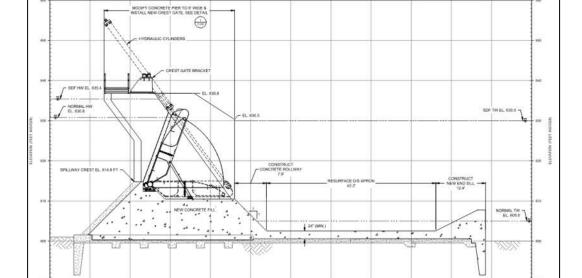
Cross Section View of Sanford Dam Crest Gates
